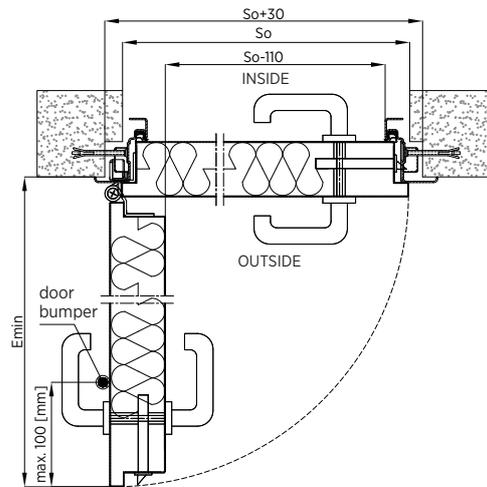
Installation in front of the opening - horizontal cross-section, opening frame without a thermal break
